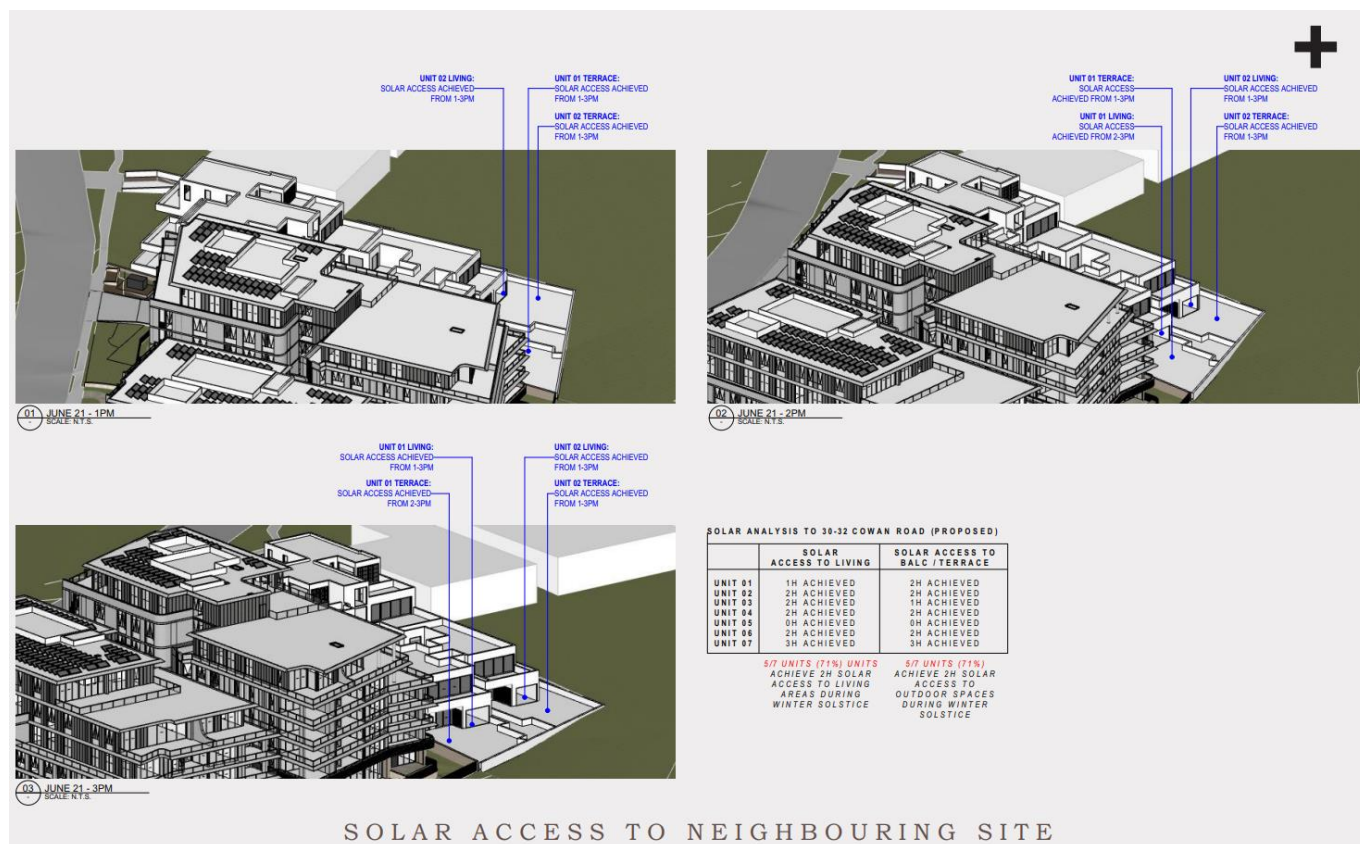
Extract of Solar Access Modelling to 30-32 Cowan Road
